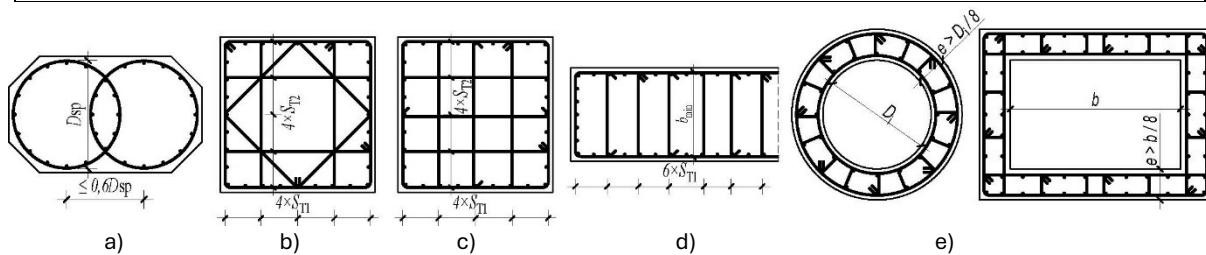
Confinement details in concrete piers using (a) interlocking spirals/hoops in polygonal cross section; (b) 4 closed overlapping hoops; (c) 3 closed overlapping hoops plus cross-ties; (d) closed overlapping hoops plus cross ties in wall type rectangular cross section; (e) closed overlapping hoops plus cross ties in hollow piers, reproduced based on [7]
